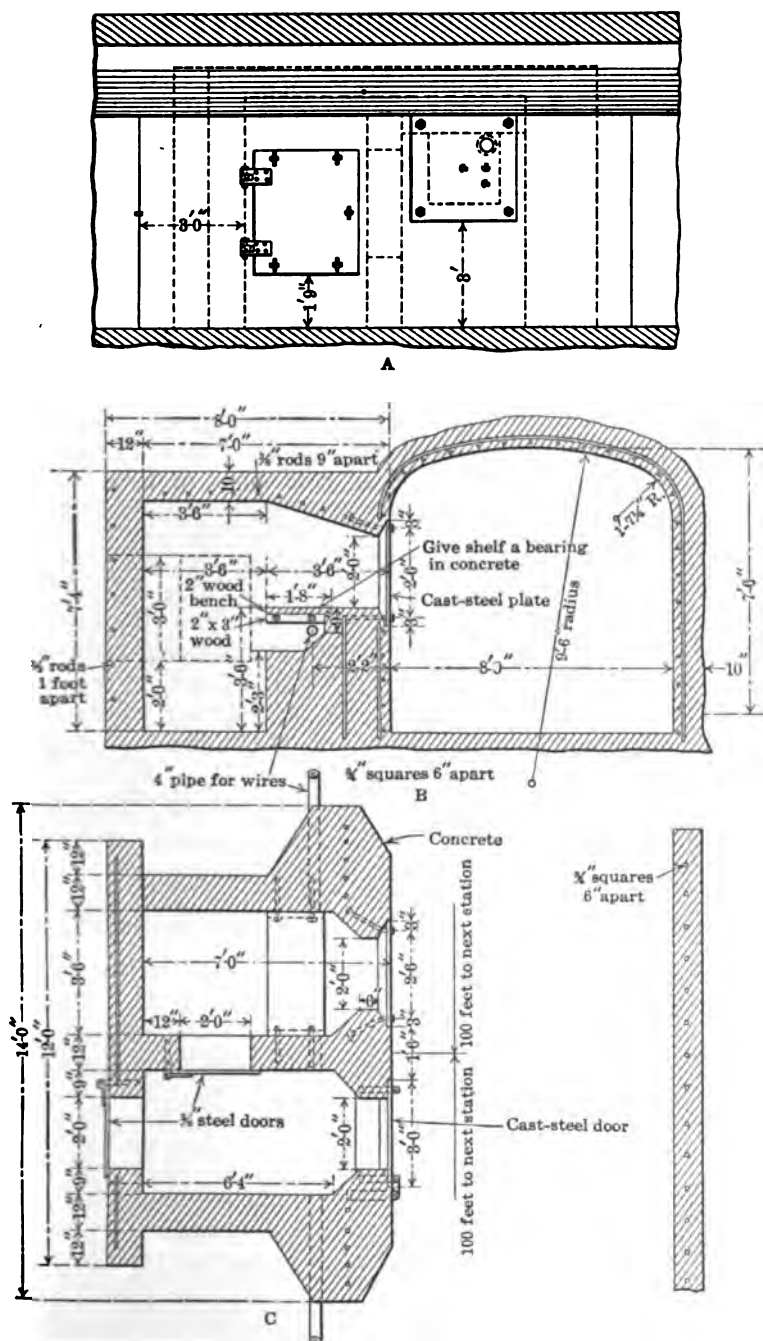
Construction of instrument chamber: A, front elevation; B, vertical section; C, plan.
